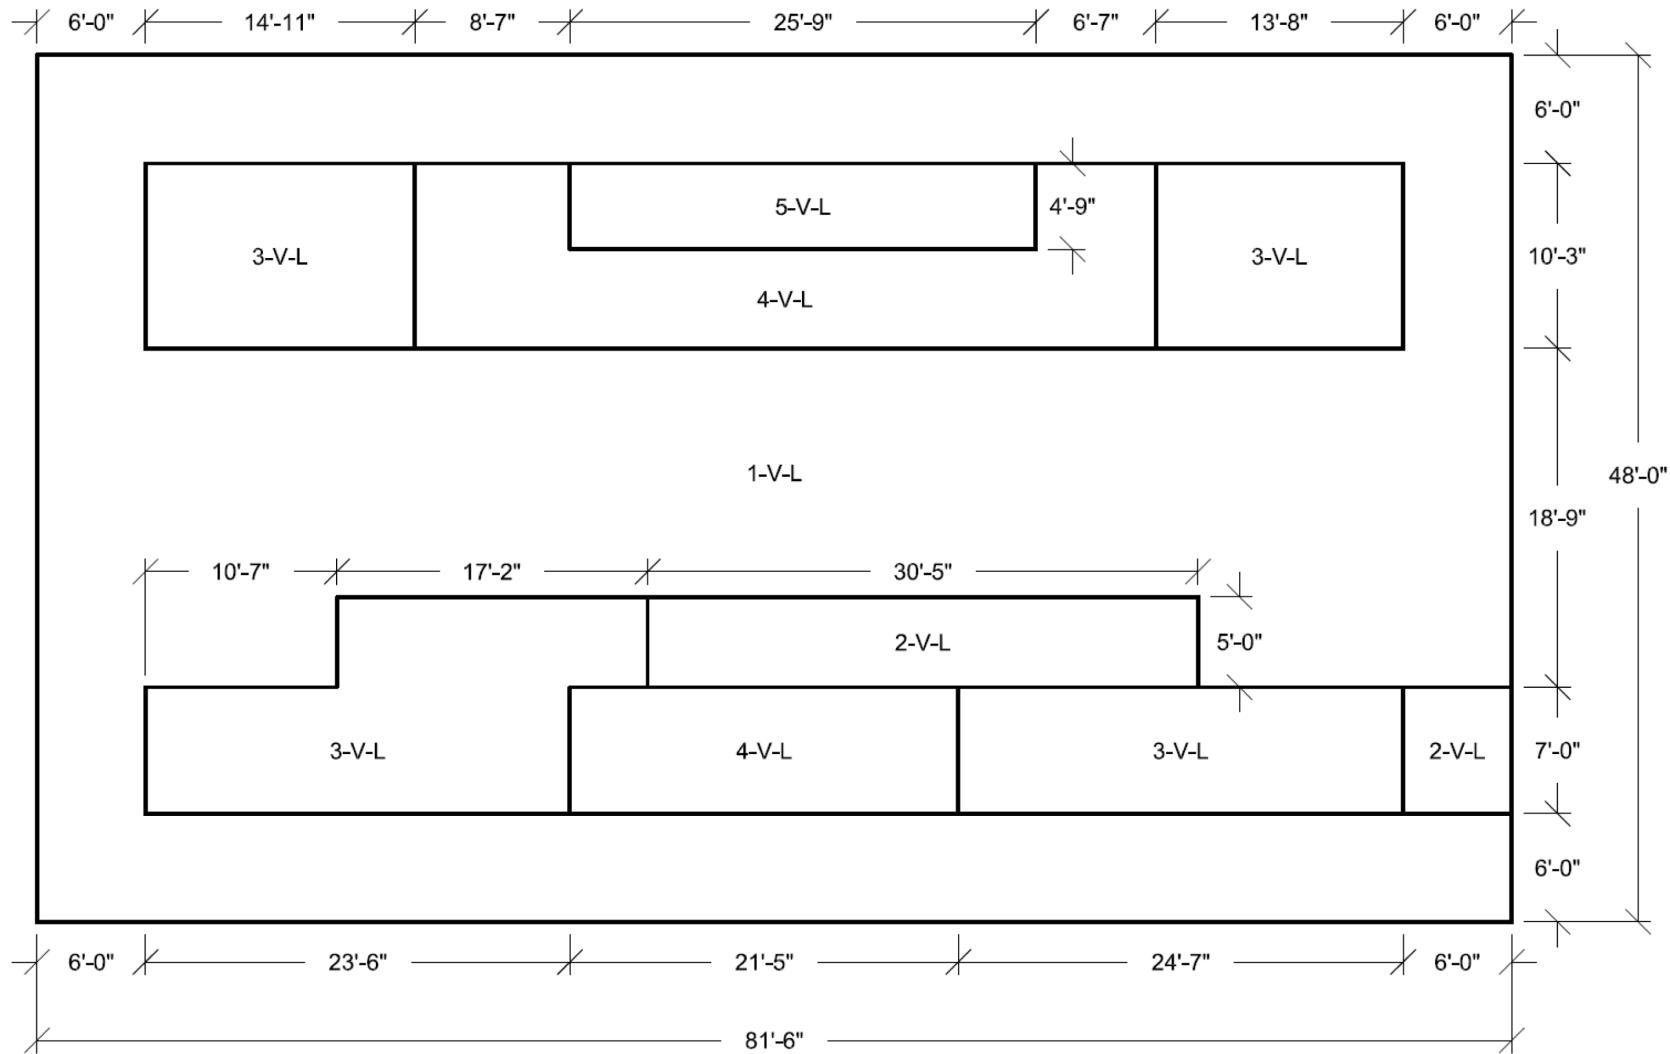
H.6-145 DGFOSV Slab 1 Looking Down Vertical Reinforcement Zones Far Side Face
